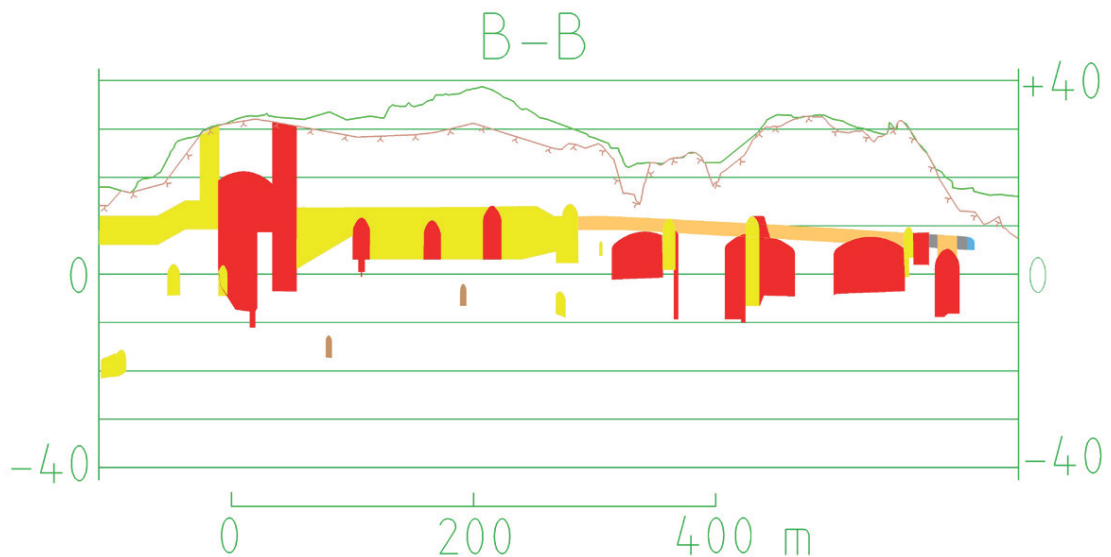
Longitudinal section of the wastewater treatment plant (20, p. 35)
